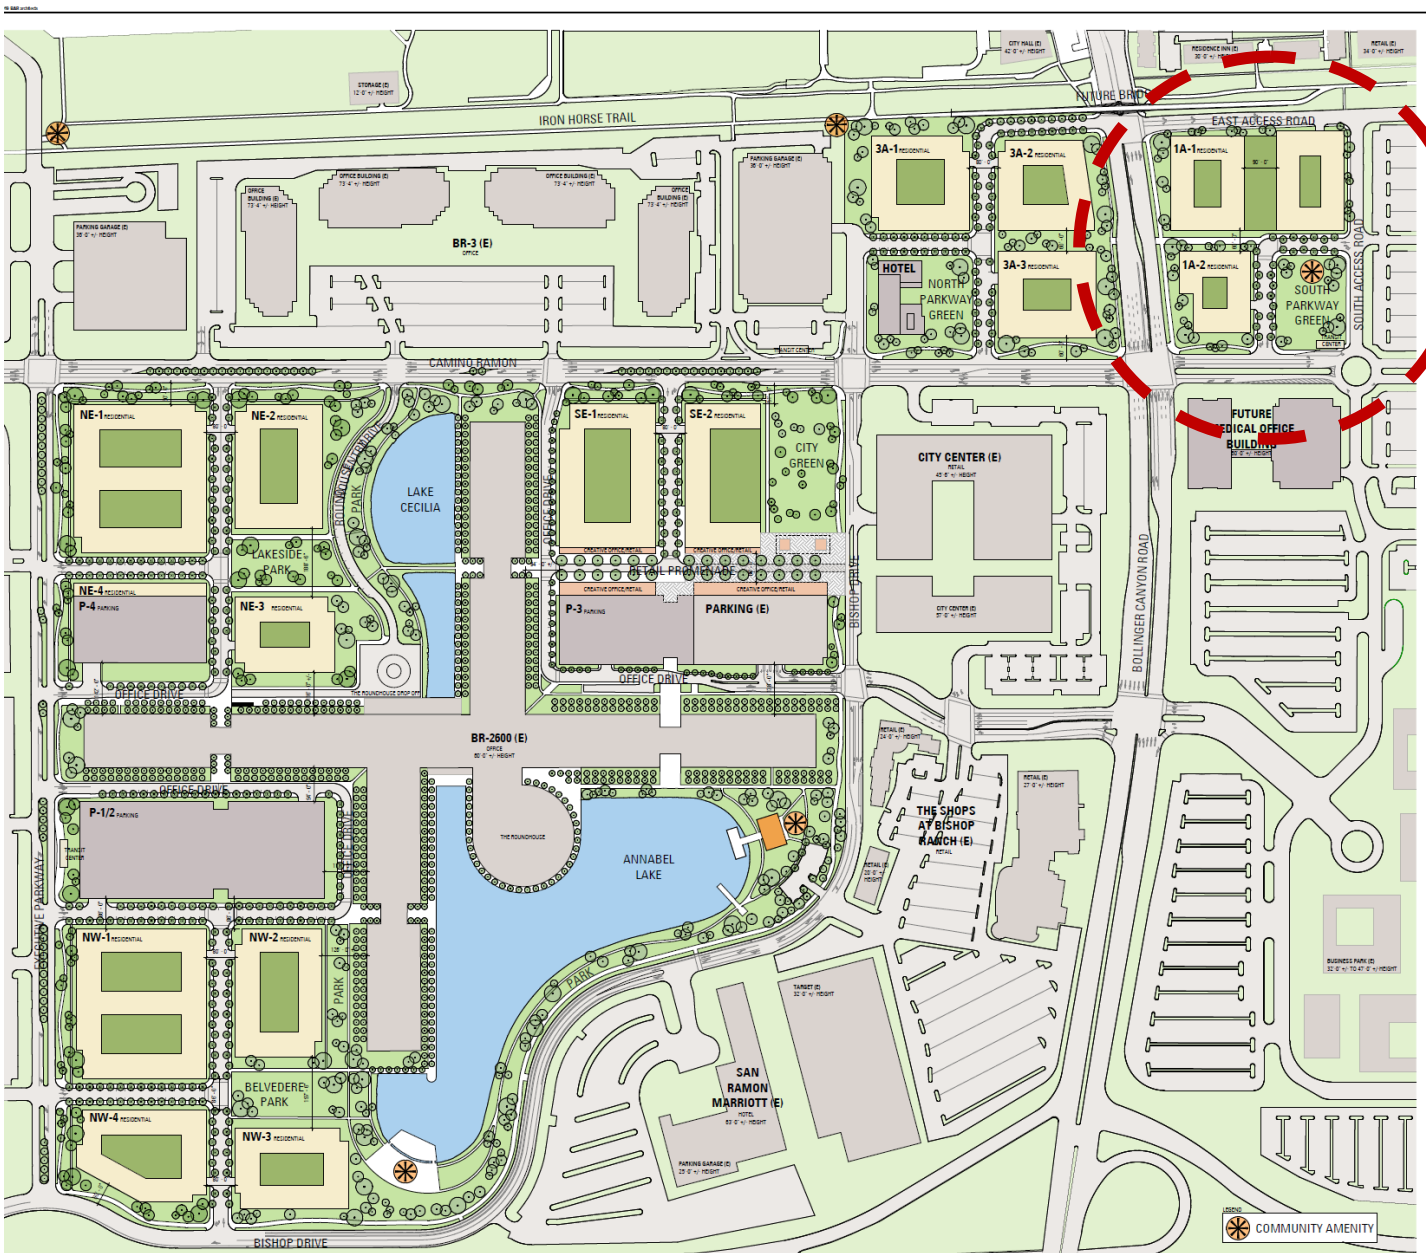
Proposed CityWalk Master Plan BR-1A Neighborhood
